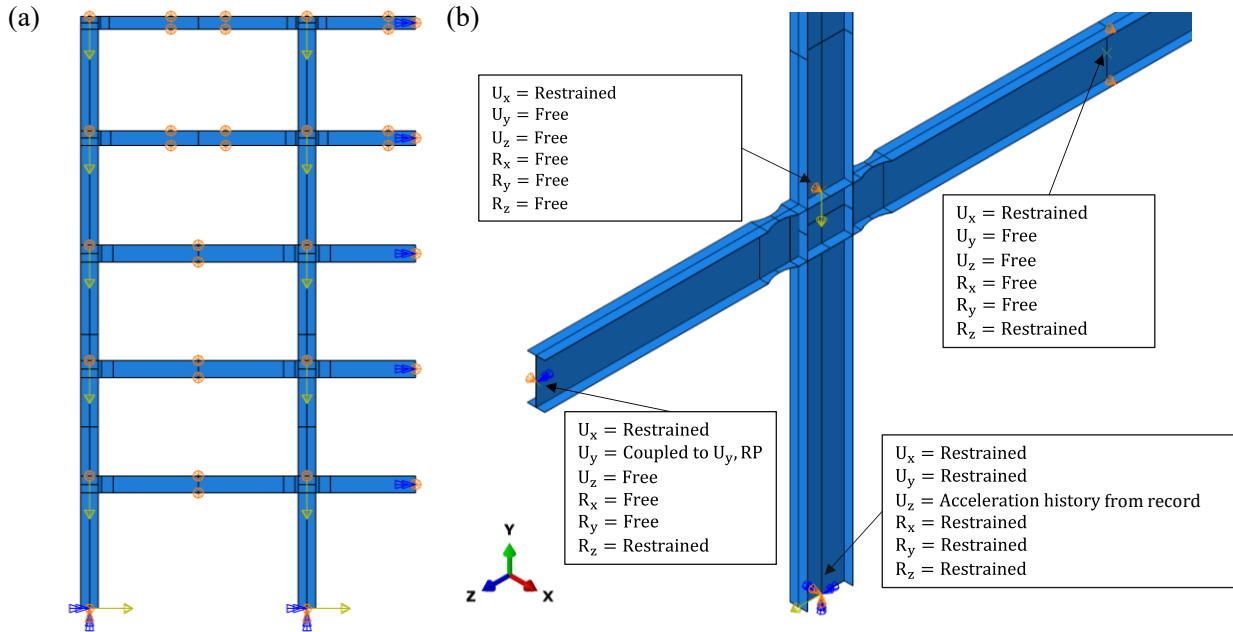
Subassembly model boundary conditions: (a) Elevation view; (b) first-storey interior column.
